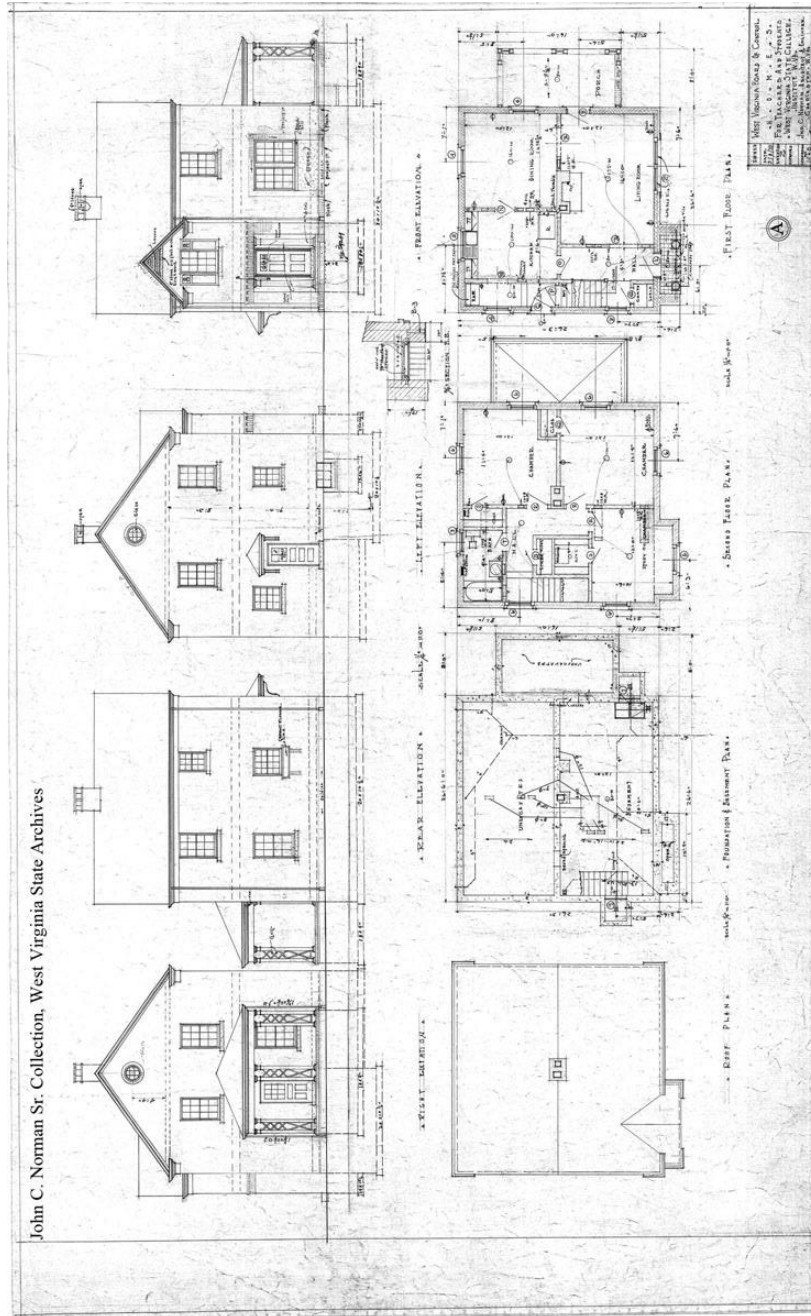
Faculty House A Floor Plan, Plan courtesy of the West Virginia State Archives, John C. Norman Sr. Collection
